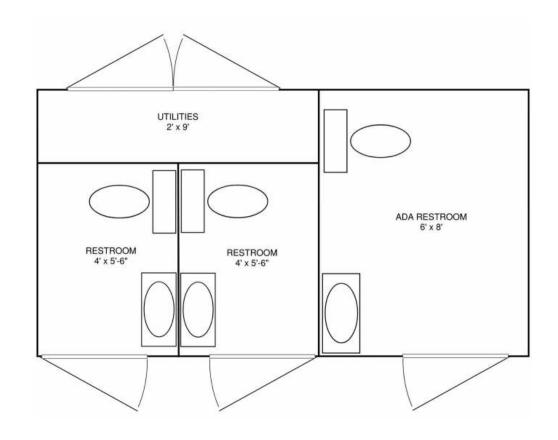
Restroom Facility Floor Layout B: Two Restroom & Storage Arrangement
